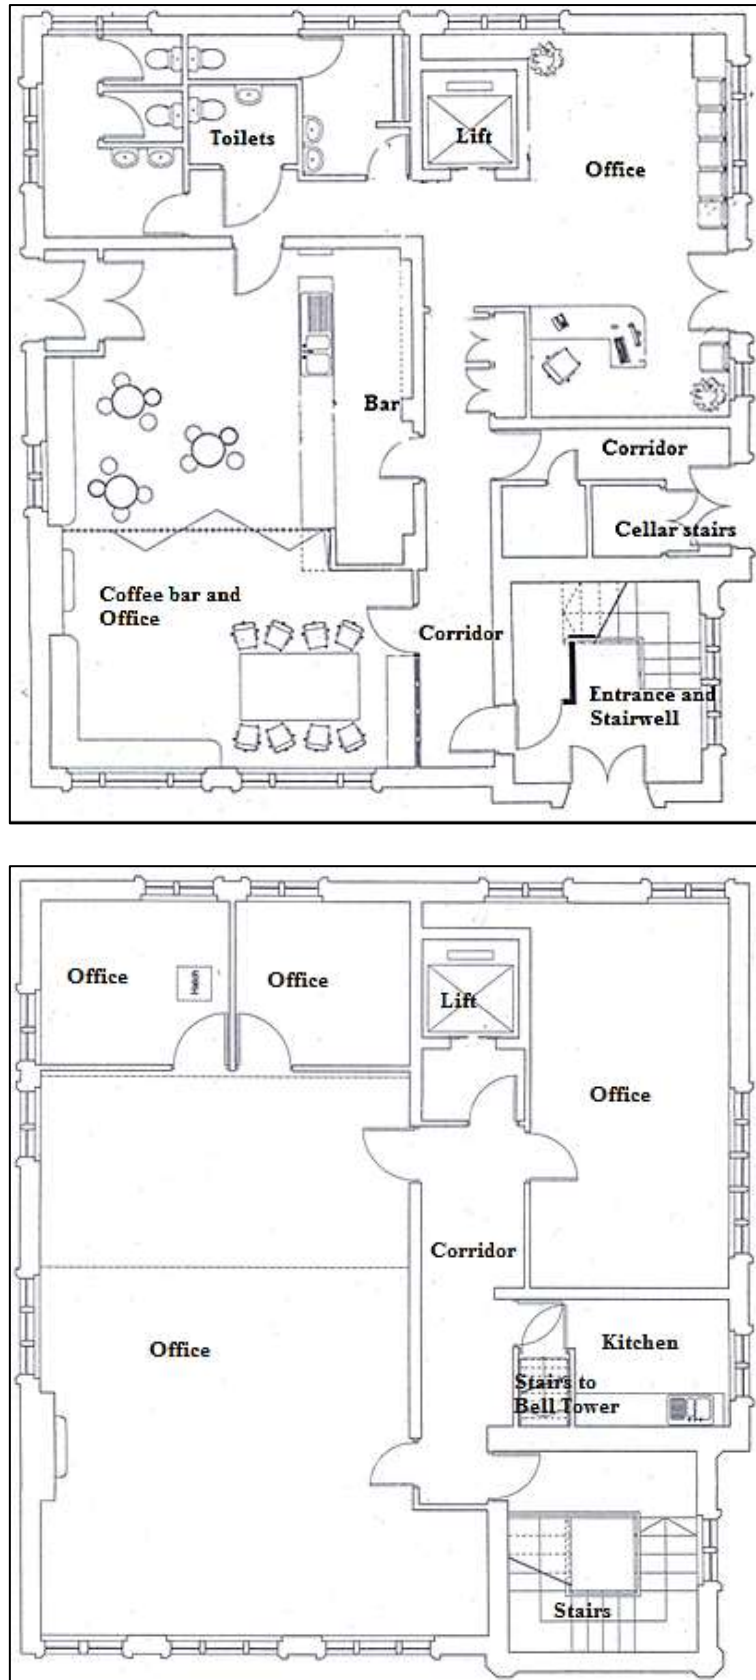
Existing Ground Floor and First Floor Plans courtesy of VASL at a scale of approximately 1:100
